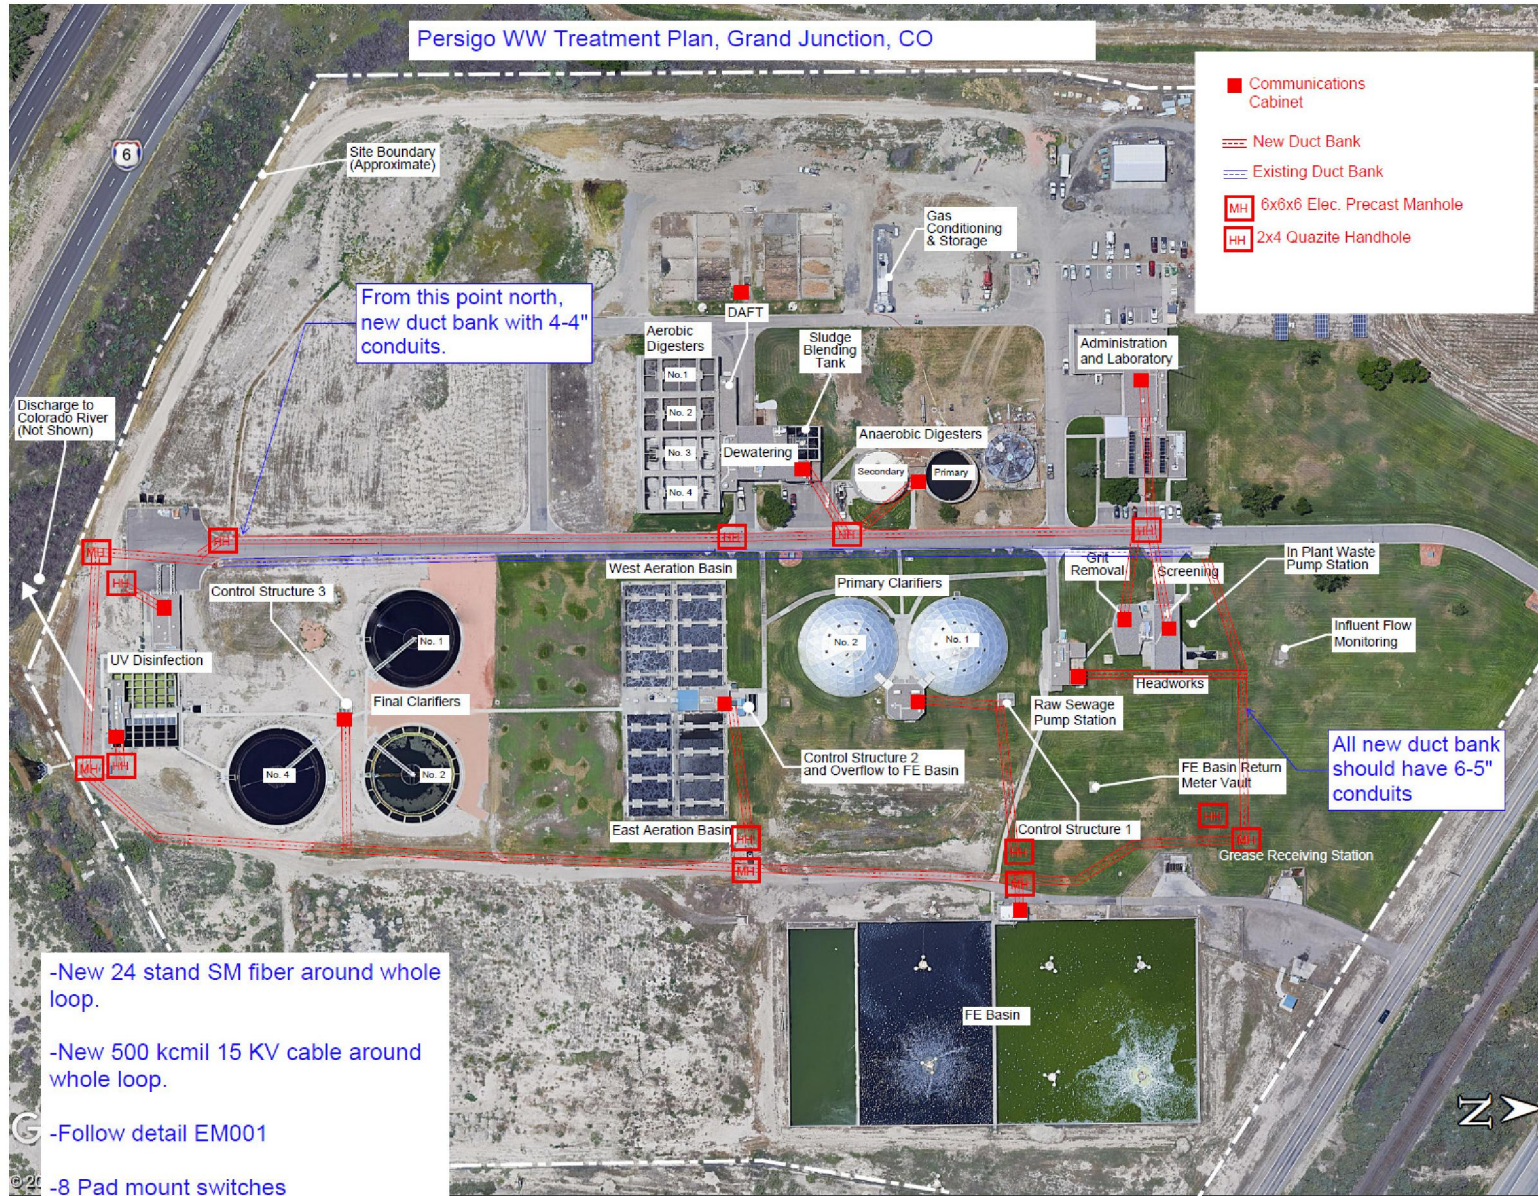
Proposed Routing for New Electrical Duct Bank
